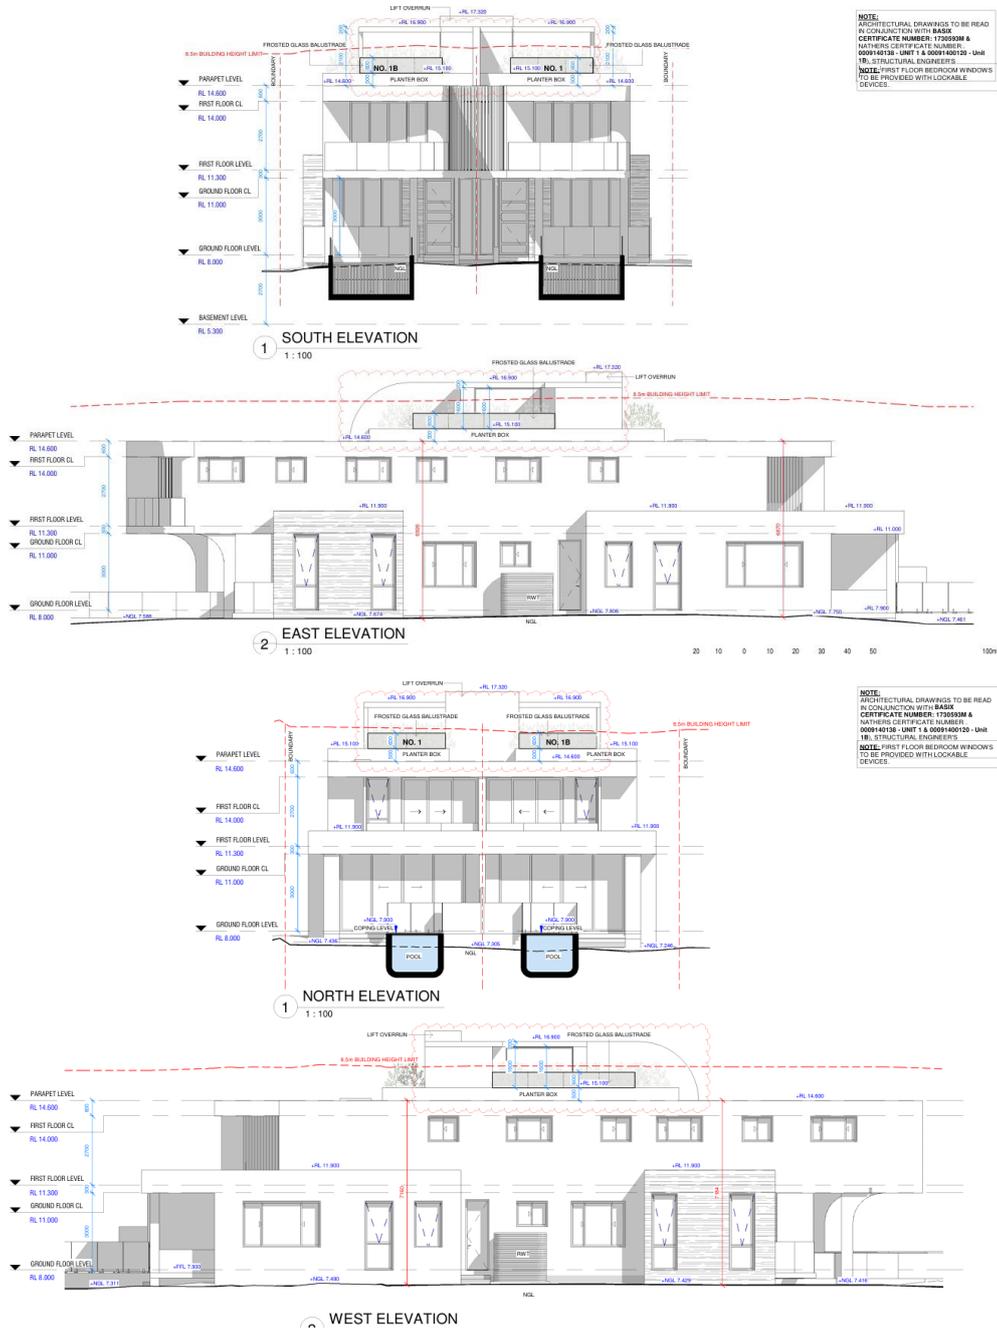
Proposed elevations of roof top terrace above approved dual occupancy (Source: Resolut, 2024).
